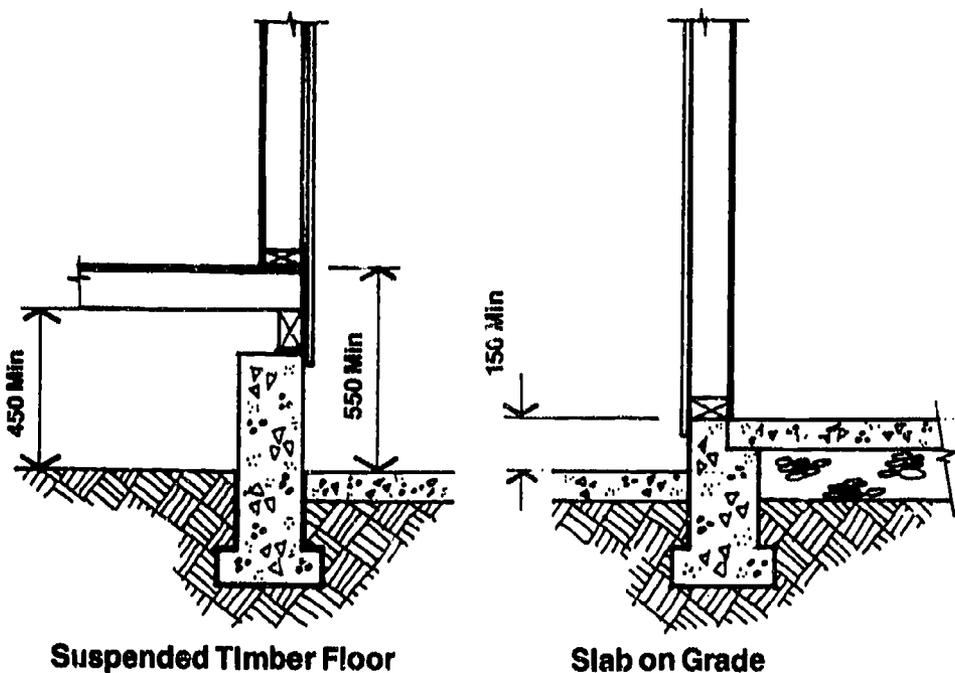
The difference in floor levels between a building with a suspended timber floor and a building with a slab on ground floor.
